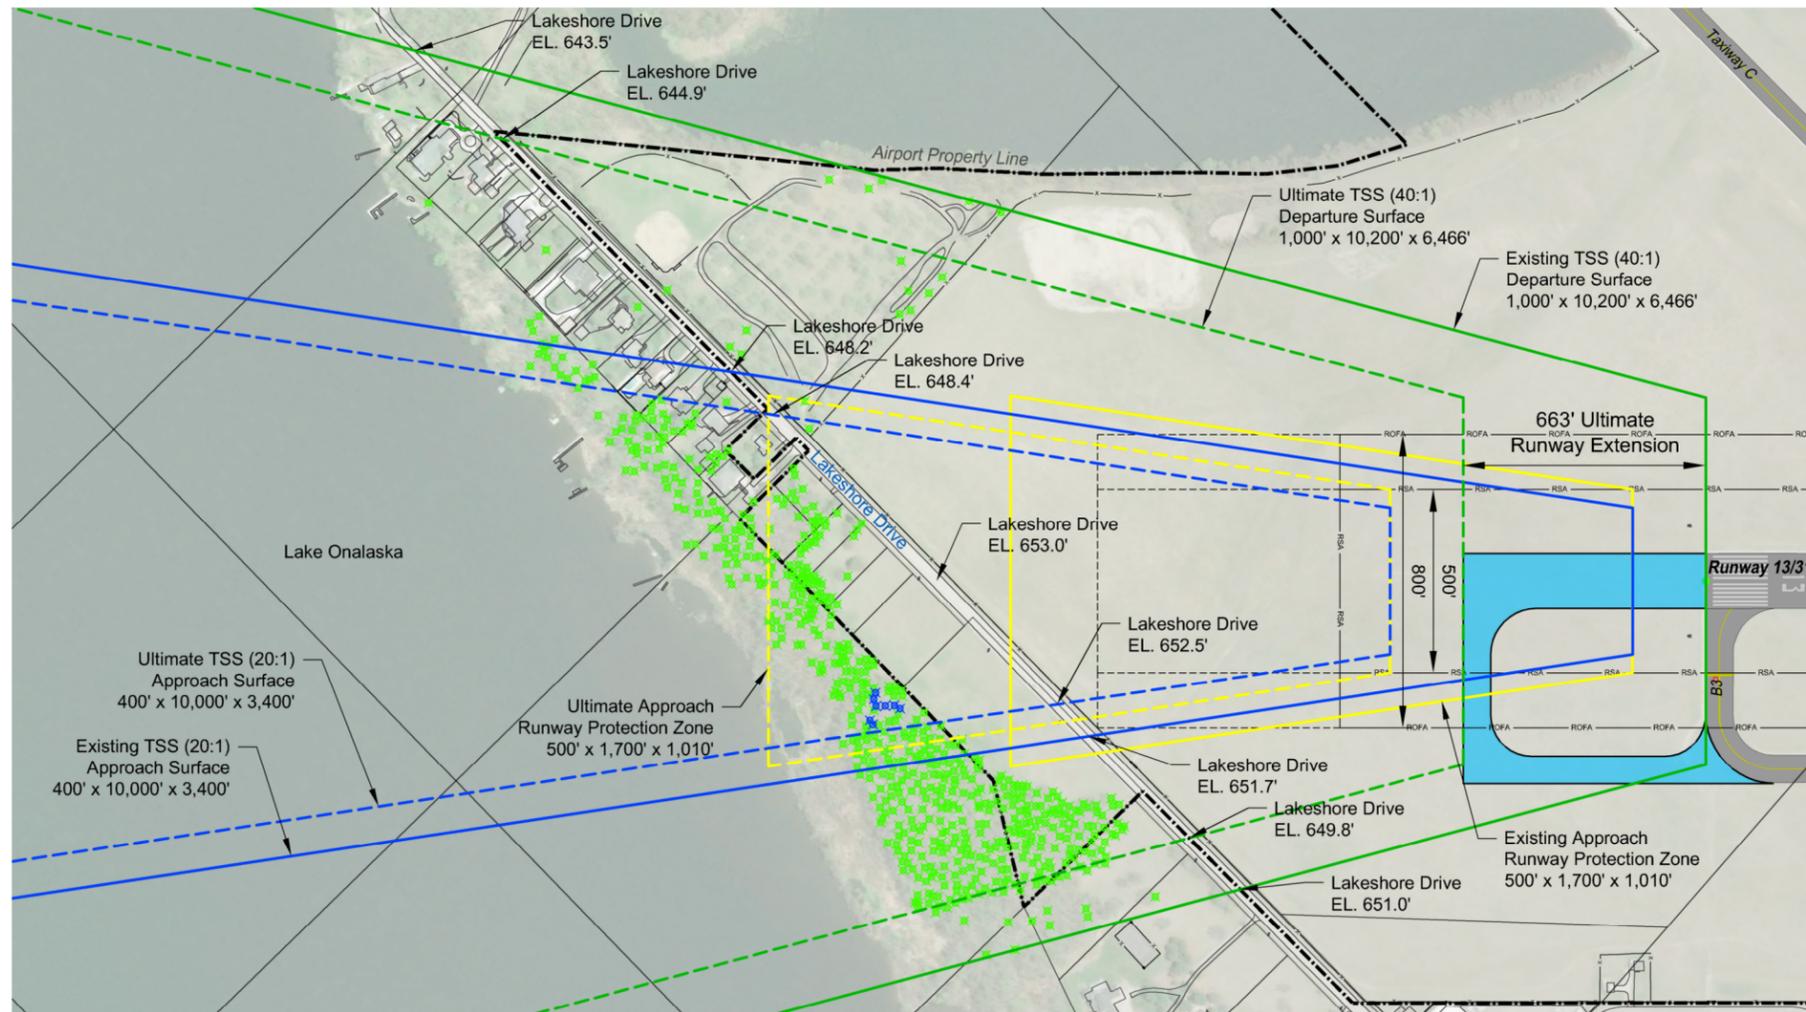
Runway 13/31 Alternative 2: Runway 13 Detail
